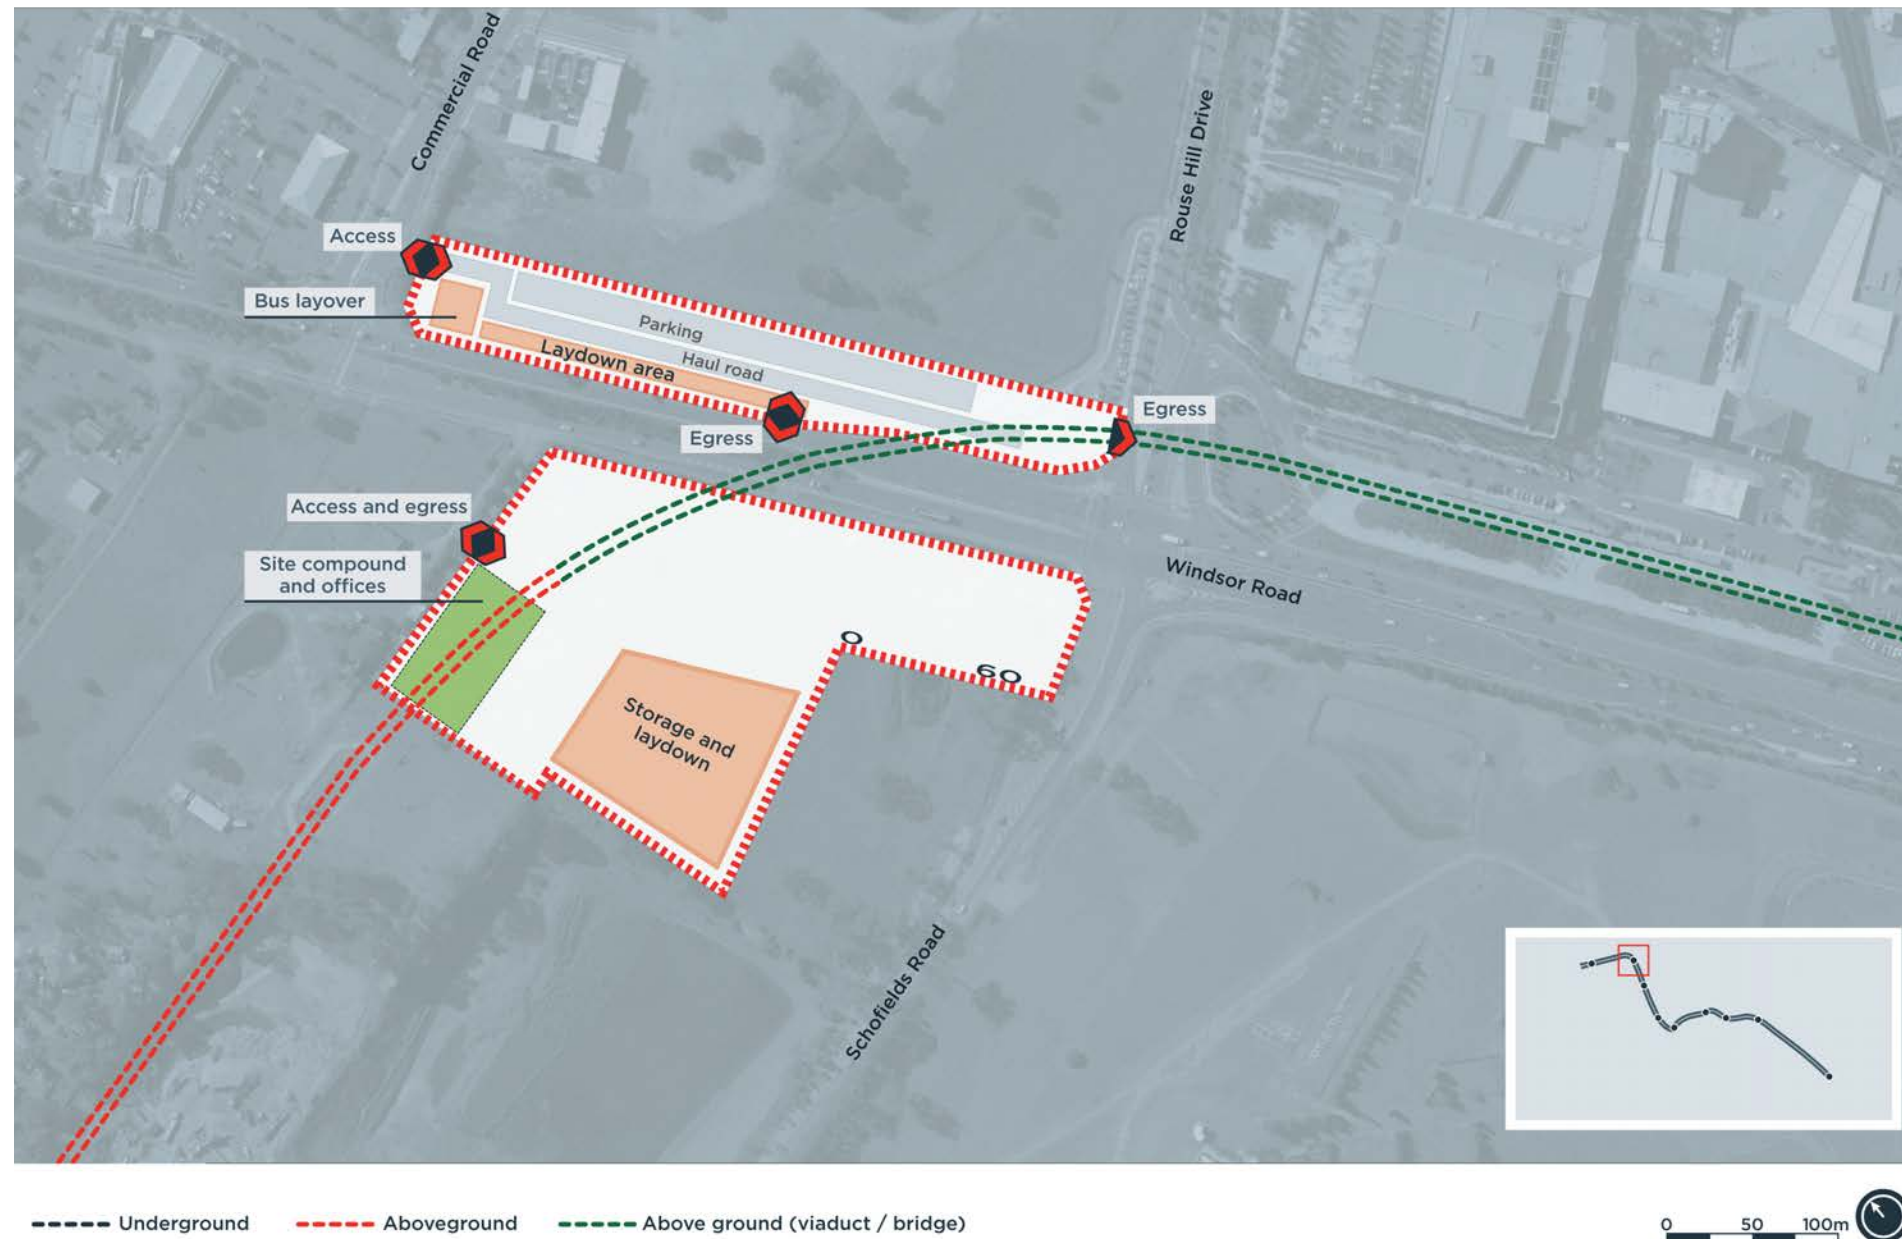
Windsor Road Viaduct to Cudgegong Road construction site layout
